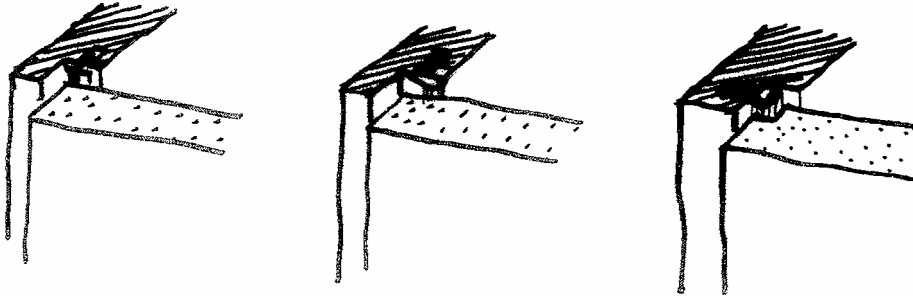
Door sweeps and sealer strips to exterior doors
